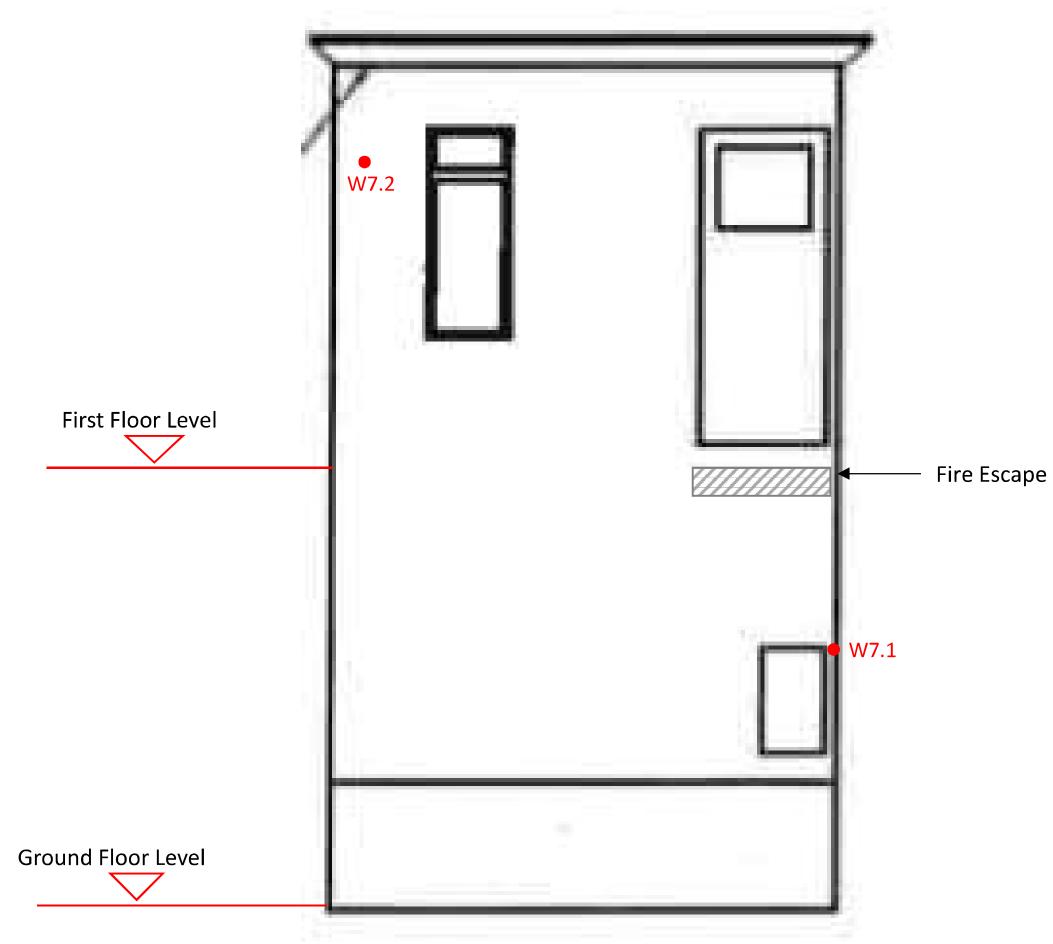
Elevation W8 of Station Hotel Building showing Defect/Observation Locations
